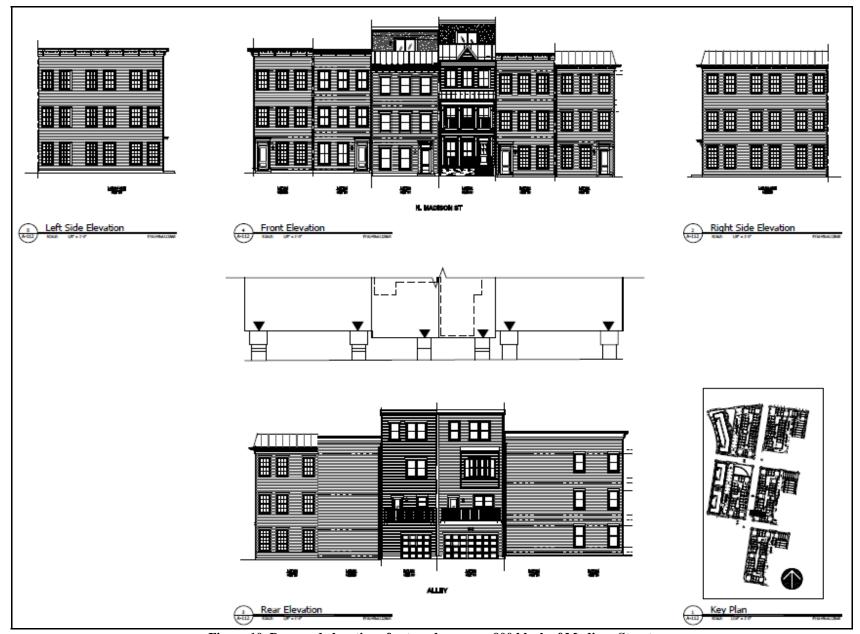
Proposed elevations for townhouses on 900 block of Madison Street.
